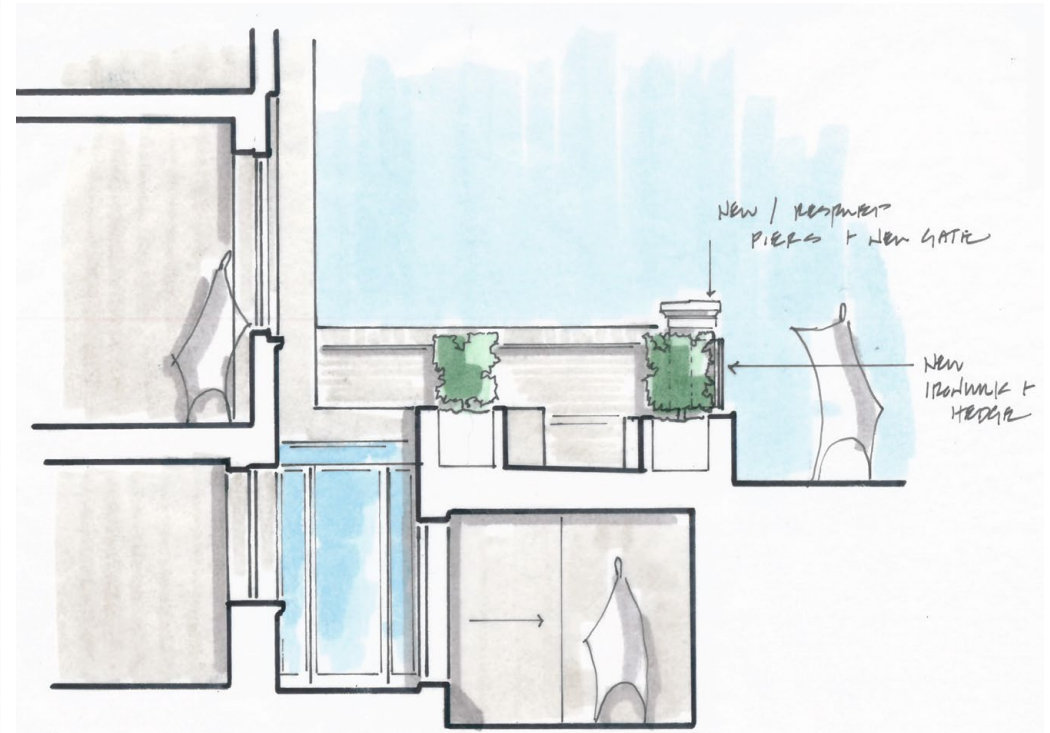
Concept image of the proposed extension (section through the front area and new room)
